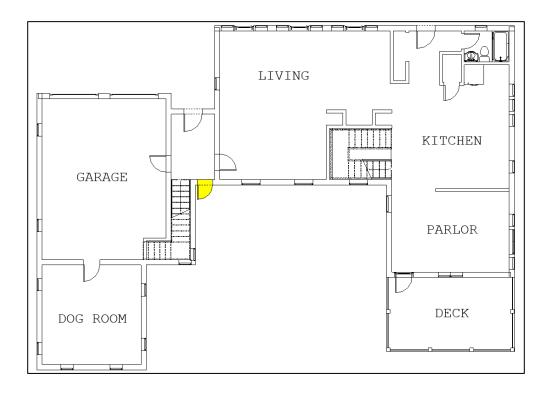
Existing first floor plan. The highlighted door is inoperable.
